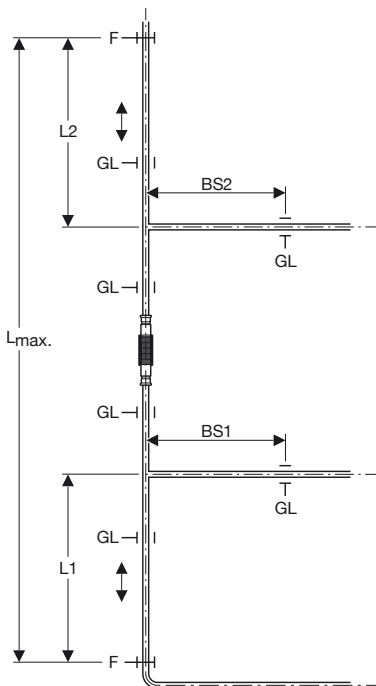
Expansion compensation by axial expansion fitting with anchor point in bottom floor.
